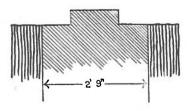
SECTION OF WALL AND DOOR SILL BETWEEN BOOMS 2 AND 8. (FROM A TO B ON PLATE VIII.)
